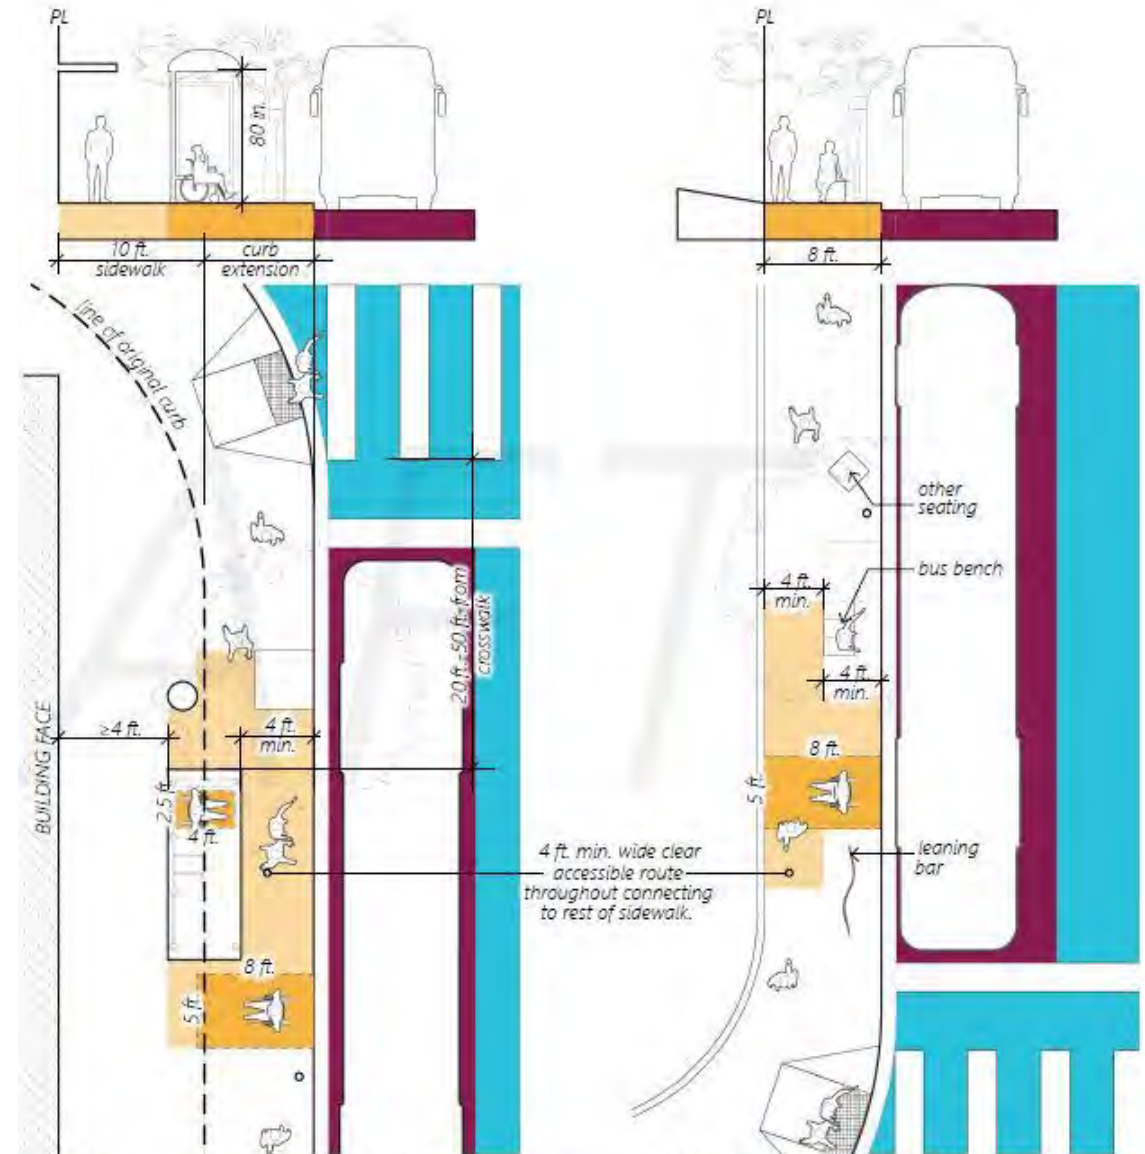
10 ft. wide sidewalk along a retail street, with a far side, in-lane loading bus stop and curb extension.
